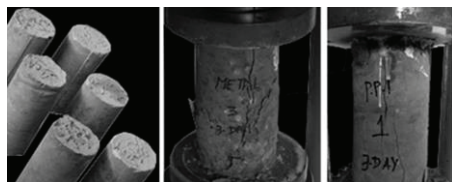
a) Demolded cylinders (left: fabric cast, right: metal cast) b) metal cast cylinder under compression c) fabric cast cylinder under compression.
